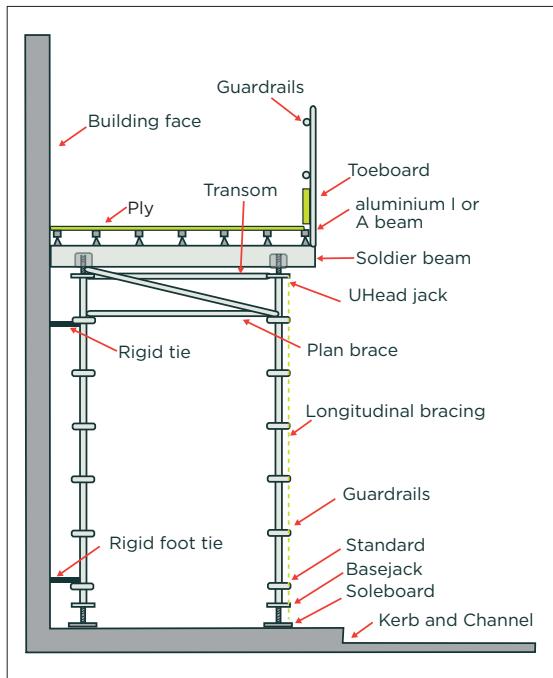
Heavy duty gantry erected from proprietary scaffolding
